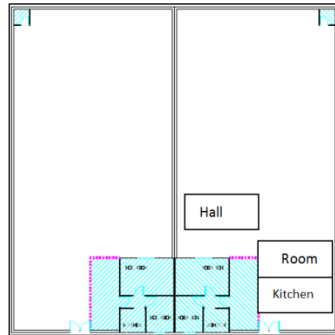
The design of floor plan of the typical post-earthquake (new) semi-detached houses in New Lar City. (Source: Muhammad Parva 2008)
